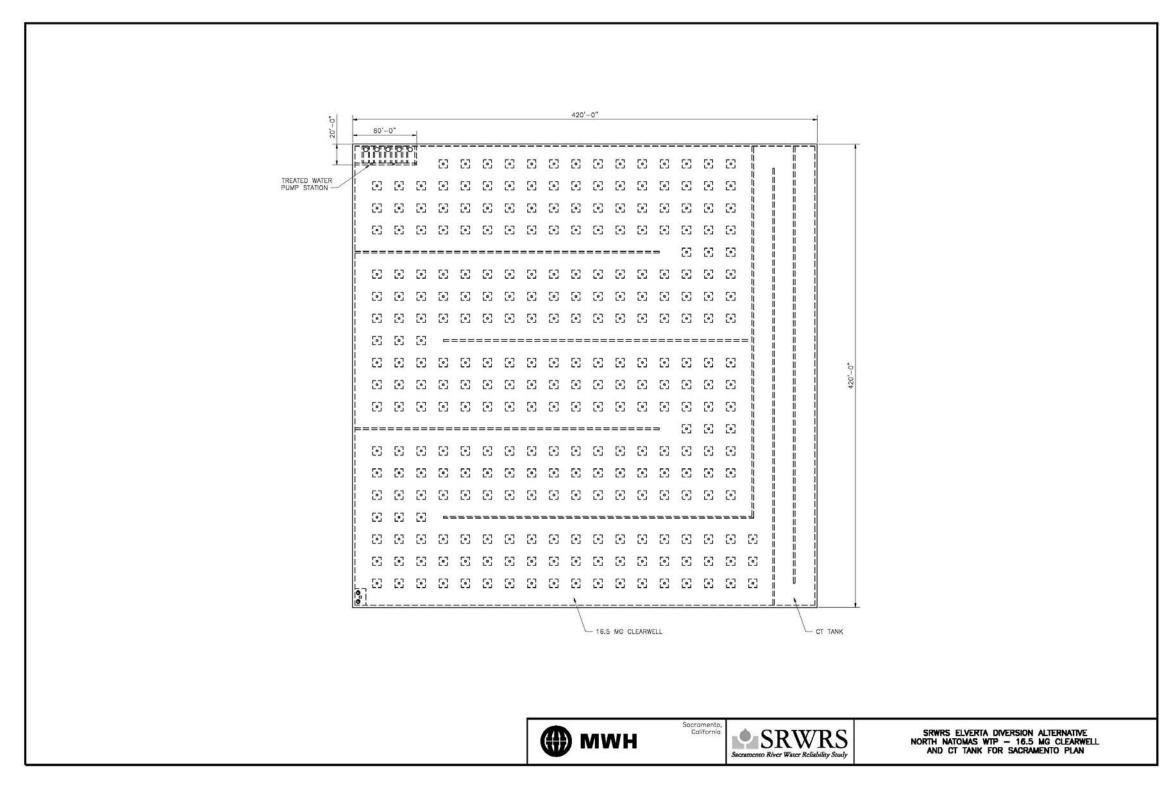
North Natomas WTP – 16.5 MG Clearwell and CT Tank for Sacramento Plan
